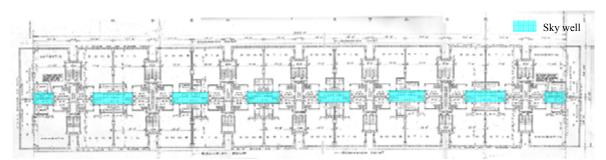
First floor to sixth floor plan of block 'E'. (Courtesy of the Buildings Department, Proposed New Buildings on K.I.L. No.s 1094 \$ 1992 and Extensions at Kowloon City Road, Ma Tau Kok Road, To Kwa Wan Road. And Mok Cheong ST. (Block 'E'), B.O.O. Ref. No. 2/4862/57.)
